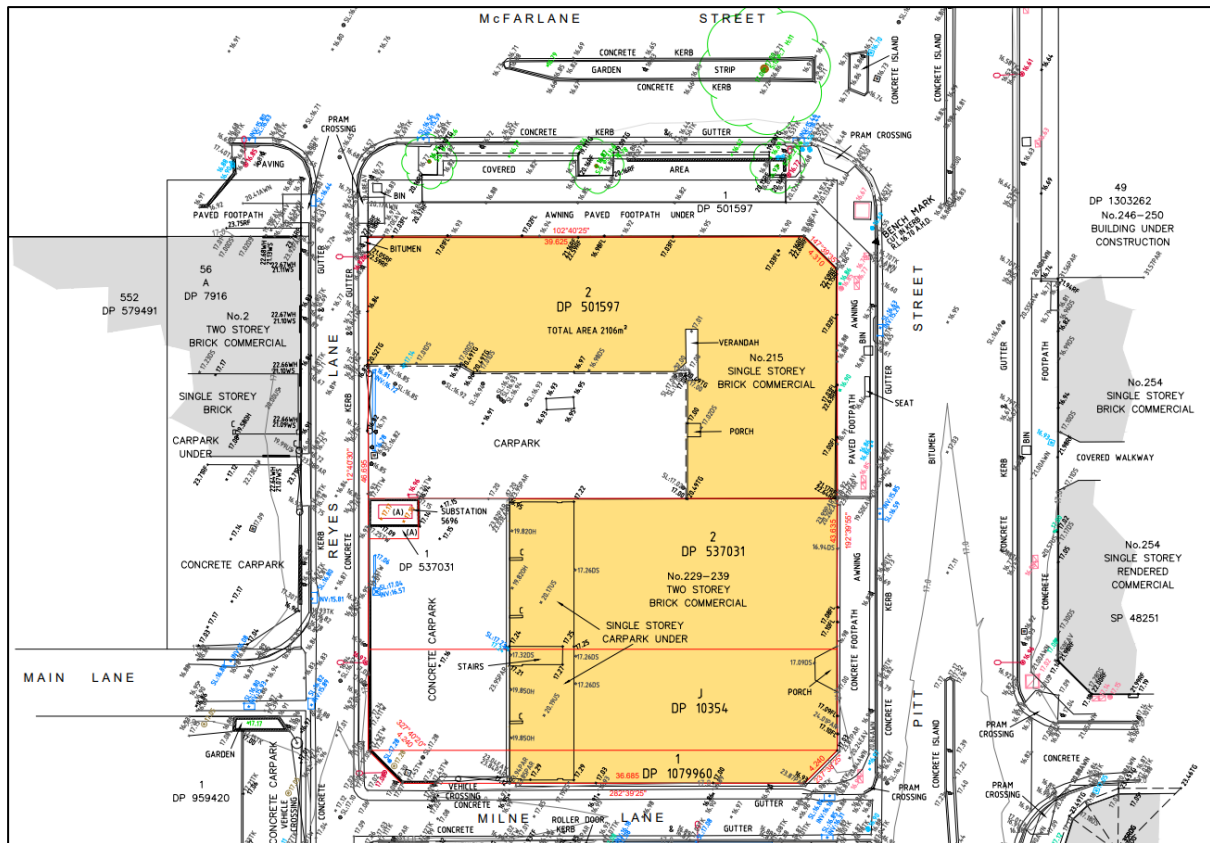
Detailed Survey Plan (Source: Beveridge Williams, 04 September 2024)
